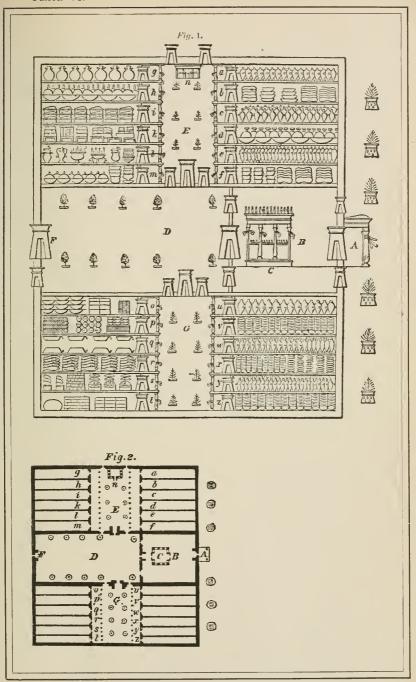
Elevation of an Egyptian house. From the sculptures. 2. The supposed ground-plan of the same.
